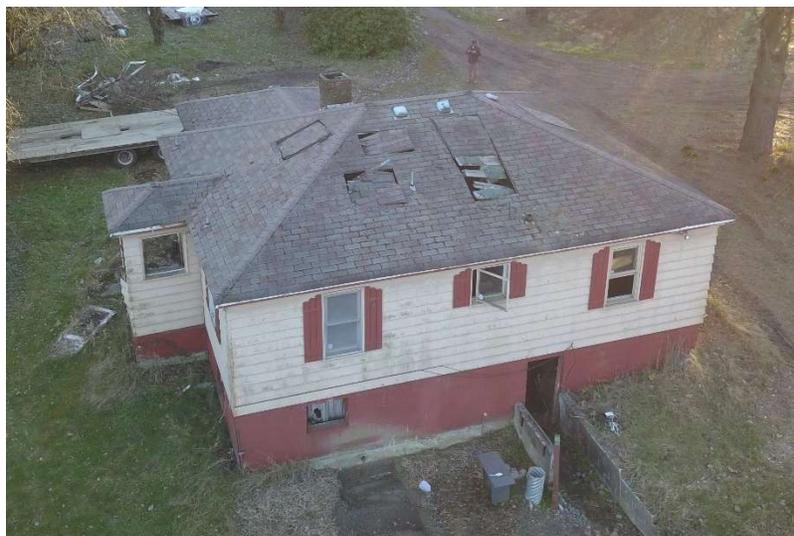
House 12030 Back(north facing) side and west facing / Arial March 2018
